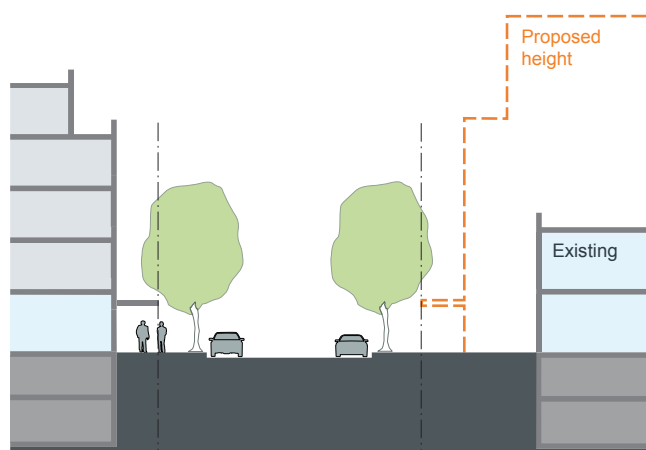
B.3 Section showing the building envelope and scale of the proposed development in relation to the street
